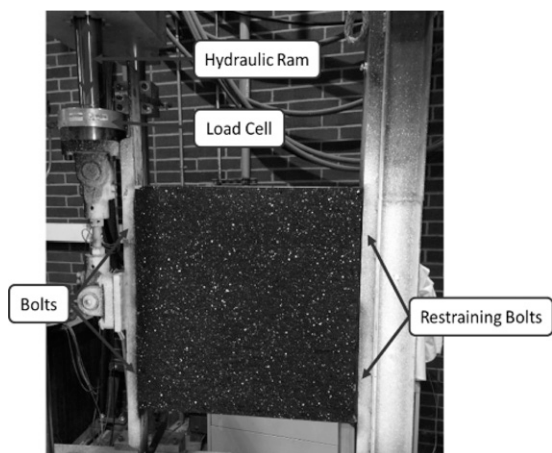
Shear wall testing apparatus. The setup is rotated 90° with the steel channel acting as a foundation.
